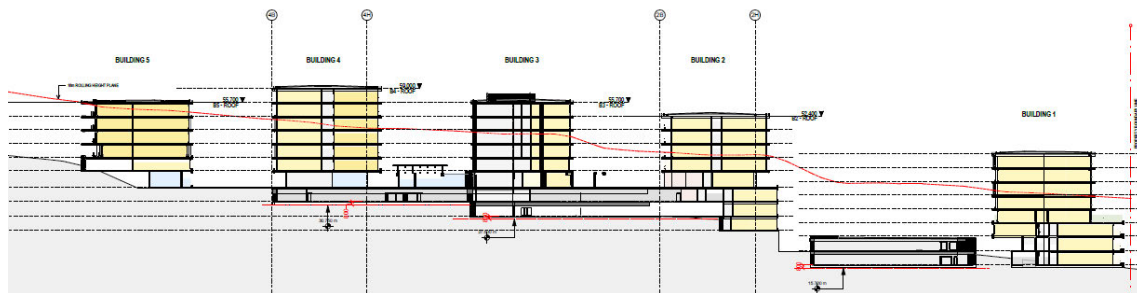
Long site section (east-west) showing the red line 16m height control and the way in which the Proposal accommodates lower and taller elements in respect of building height (refer WAM RC Drawings Sheet RC30-01).
